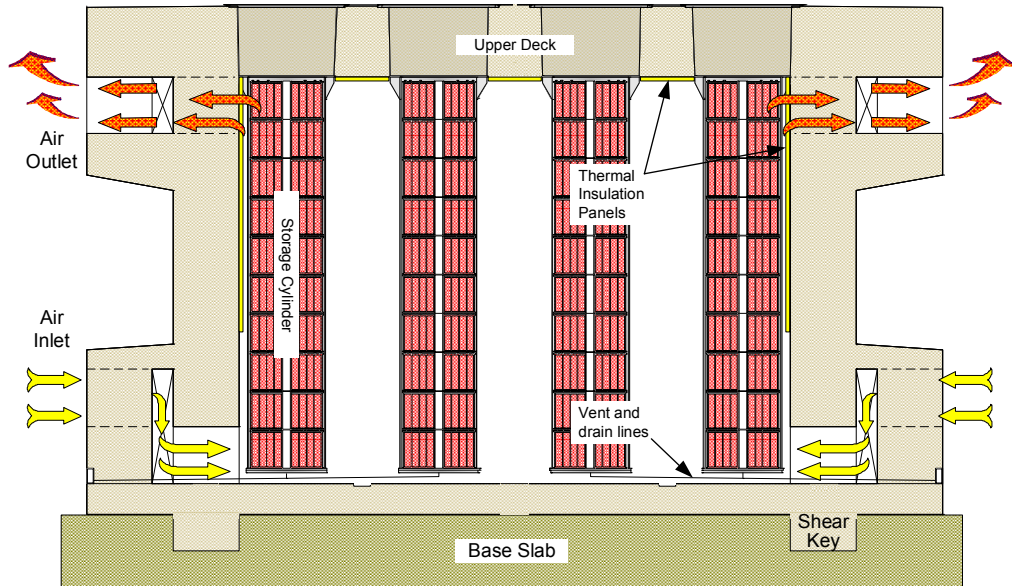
Elevation view of a typical MACSTOR-400 module.
